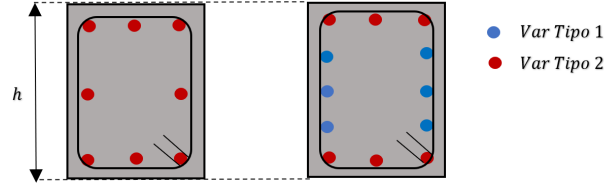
Longitudinal rebar distribution over a rectangular isolated footing element.
